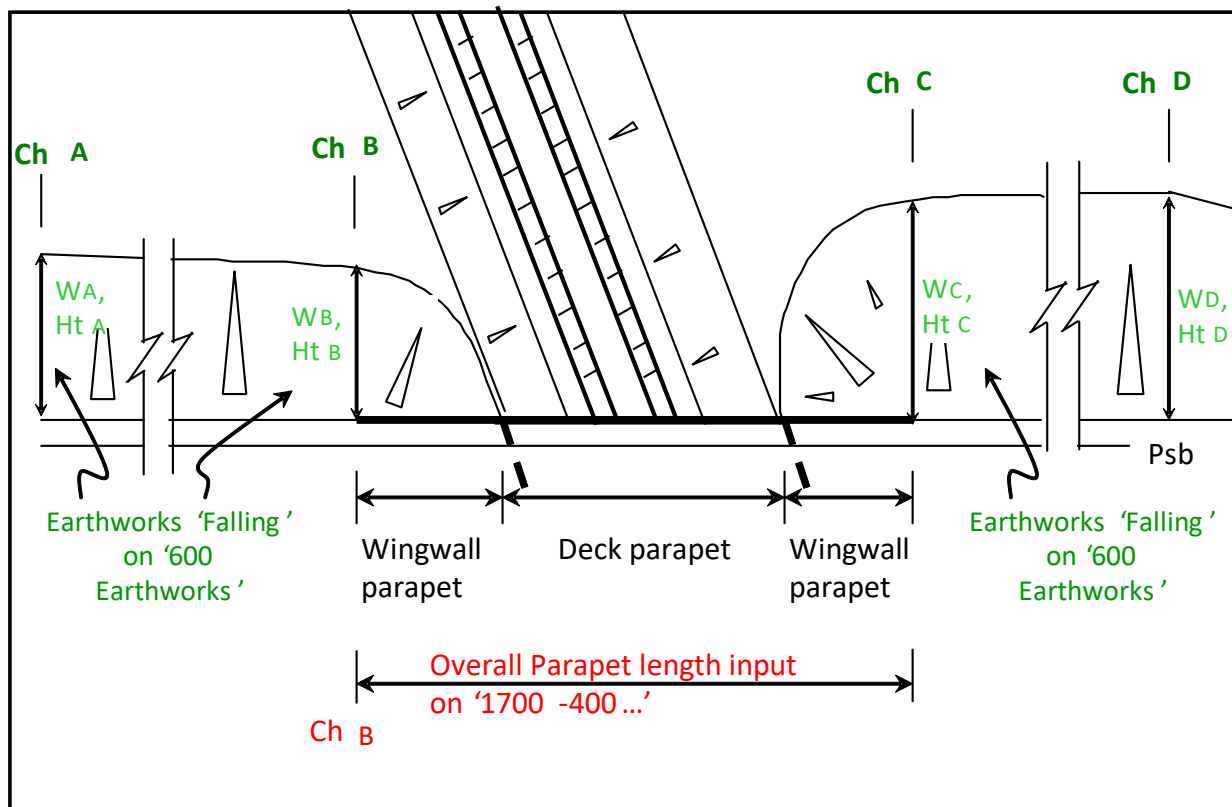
Parapet, Earthworks and Railway Inputs at Underbridge with Parallel Wingwalls (Road Inputs broadly similar)
